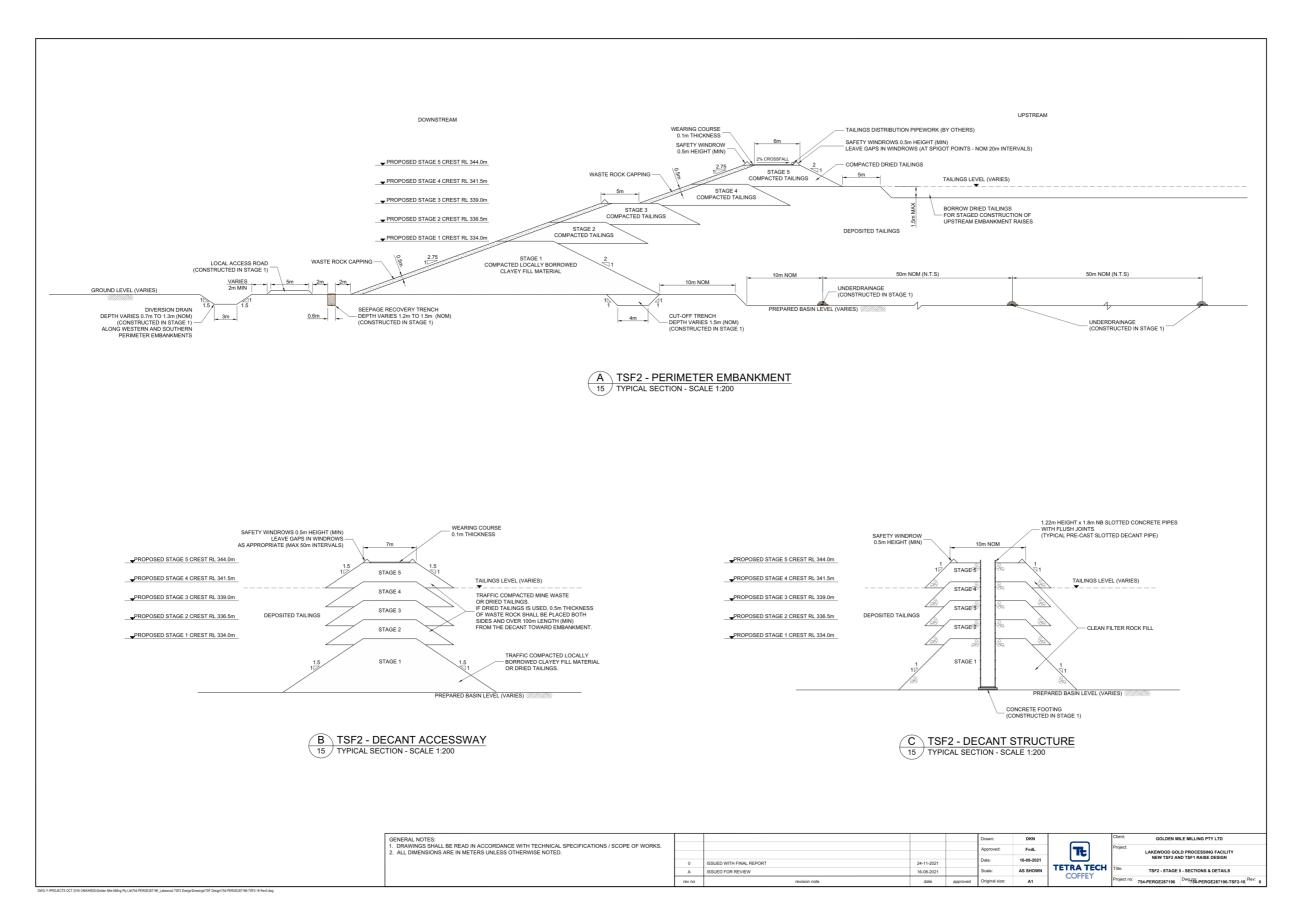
TSF2 – Stage 2 to 3 construction drawings
